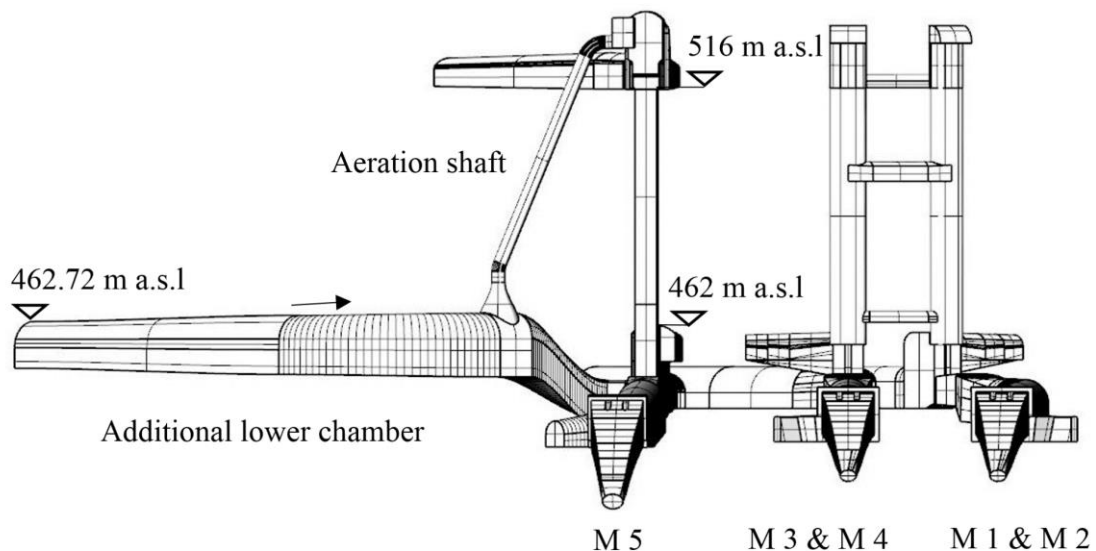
Layout of Tonstad surge tank with proposed attached additional lower chamber, front view (Stern [110], modified)
